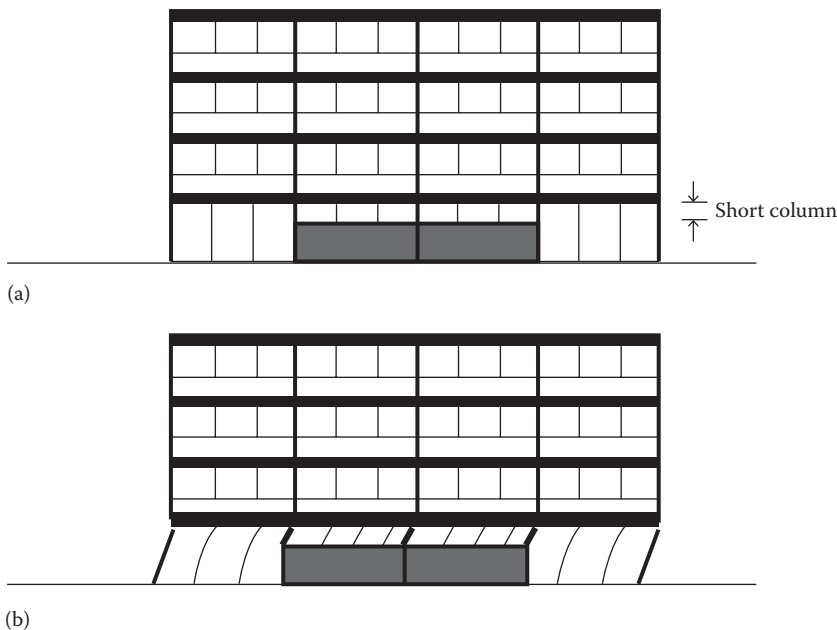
Creation of inadvertent short columns: (a) partial floor-height panel infill and (b) failure pattern.
